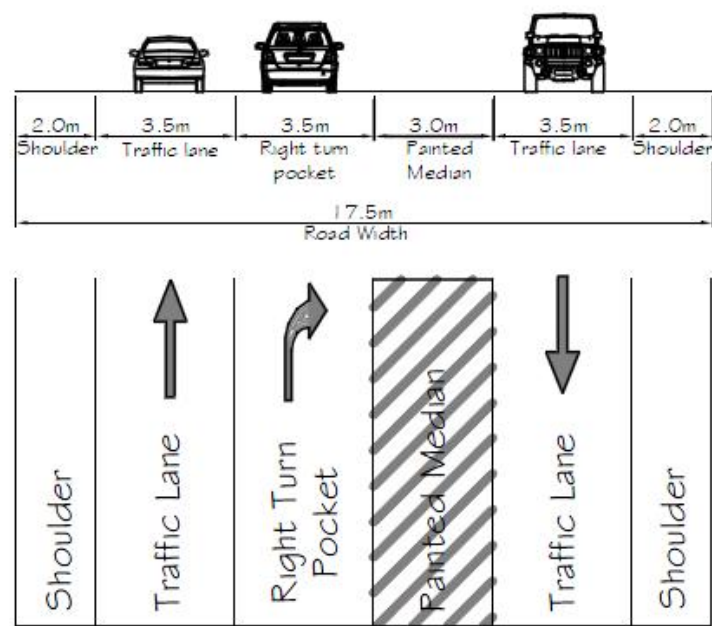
Recommended cross-section for Western Corridor Port Access road at the intersection
